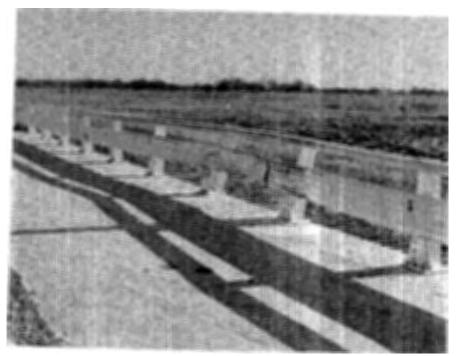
Damage to Railing After Test 4182-3 (Ref. 15).
